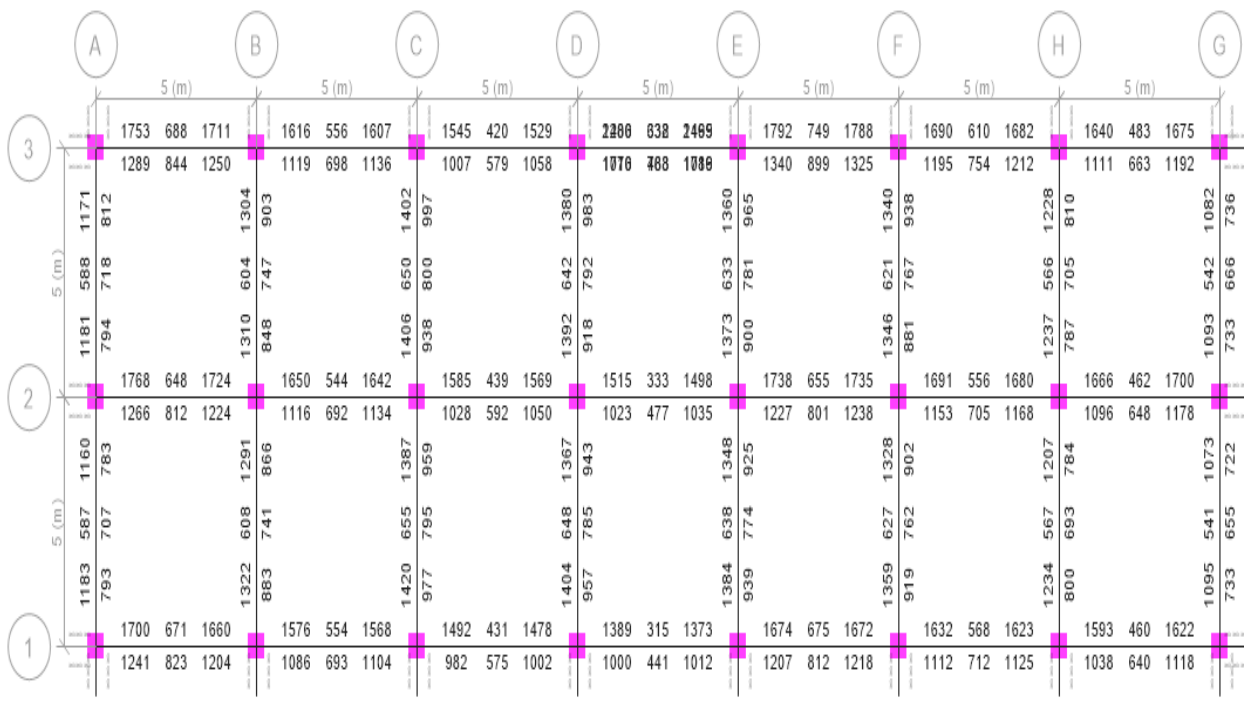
5 Sample designs of buildings in the plan view for regular plan model
